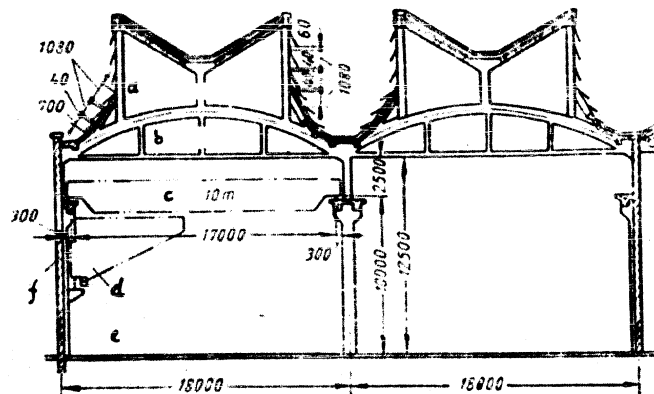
Cross Section of Building of Iron-Foundry Shop with Segmented Trusses of Reinforced Concrete
